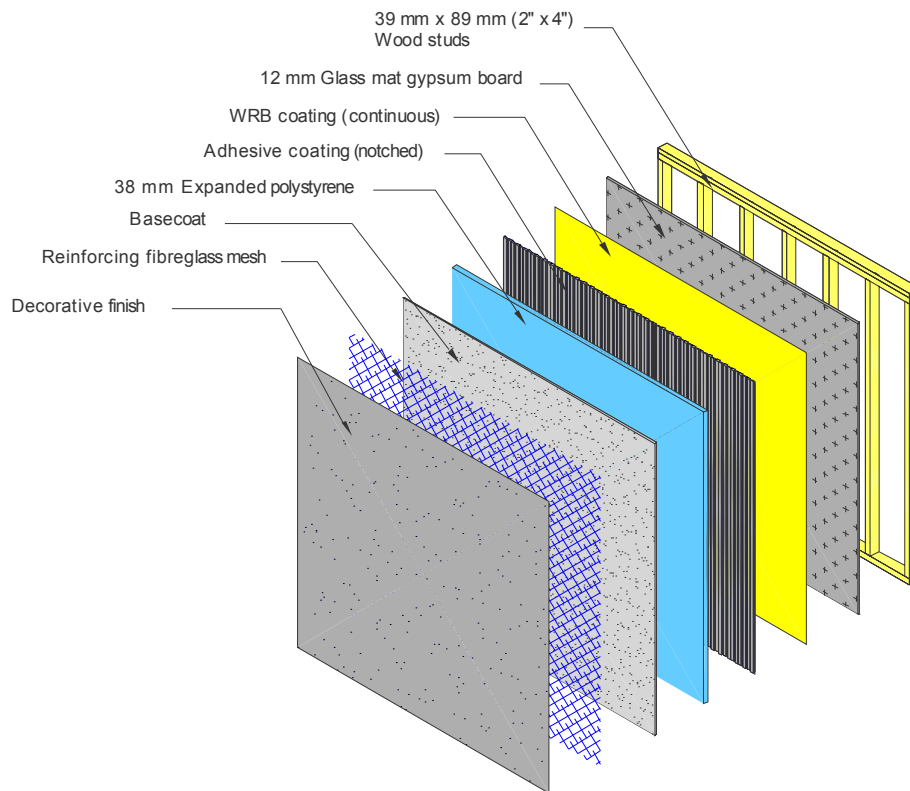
EIFS-clad wall (specimen No. 8) with a WRB and an adhesive coating notched for drainage
